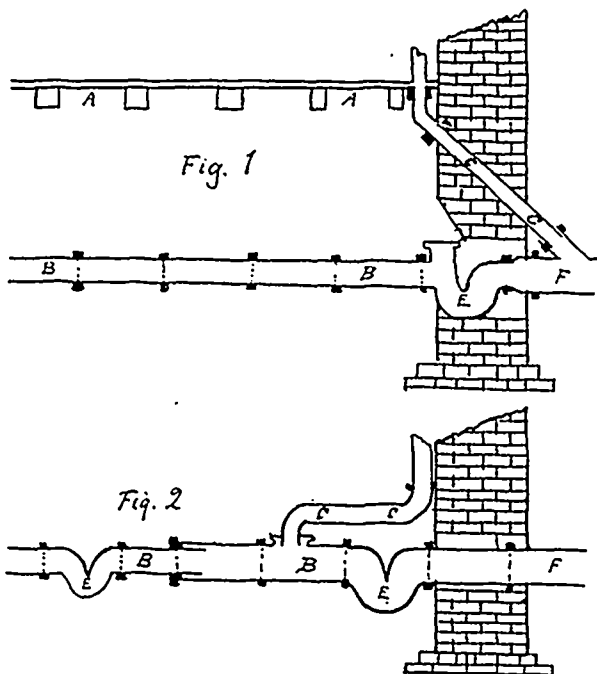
Plumbing arranged in a satisfactory manner. Fig. 2—Plumbing as actually installed. A A—Factory floor. B B—Tile drain below floor. C C—Soil pipe. E E—Traps. F F—Street drain.
